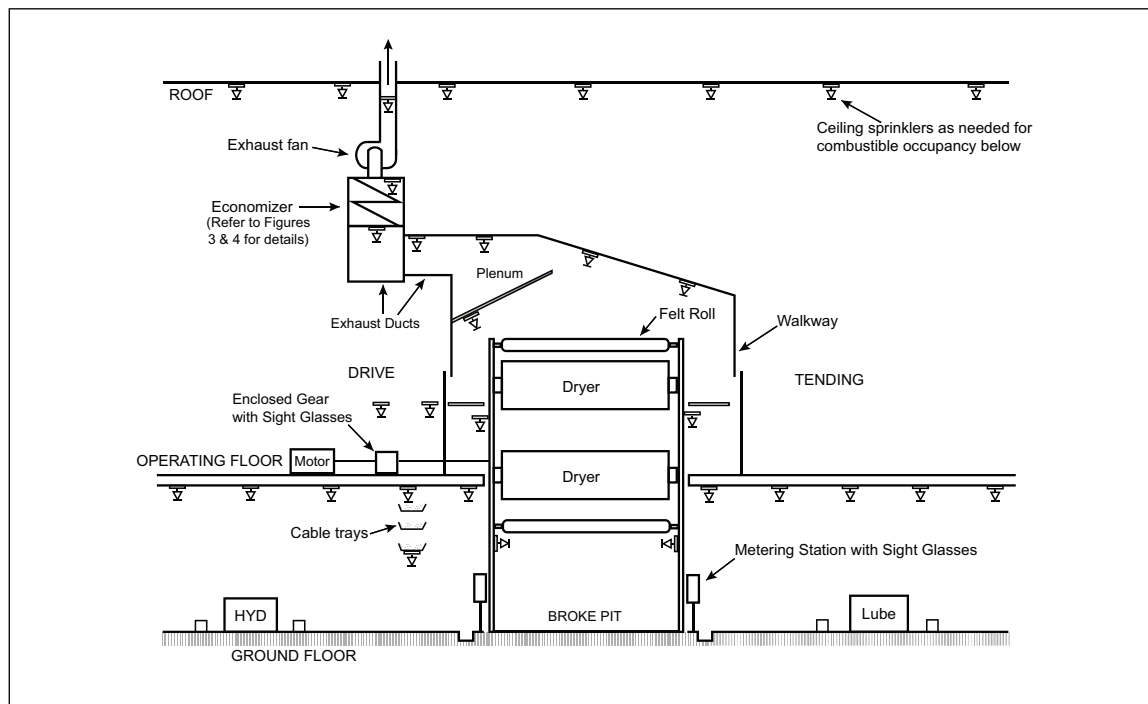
Example sprinkler coverage in and around dryer hood with partial width concealed plenum
